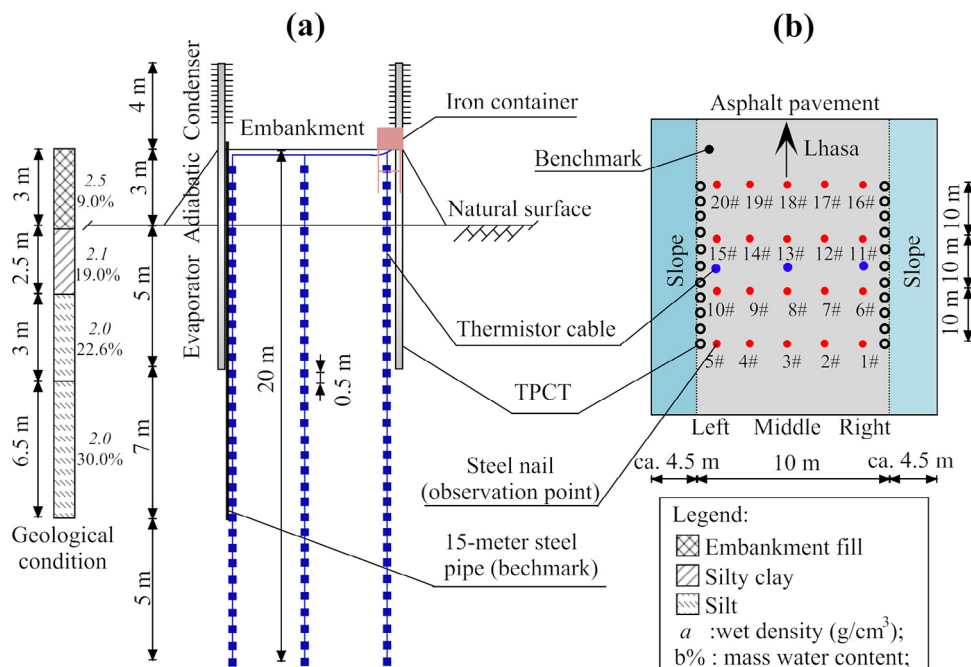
Schematic cross-section (a) and plan (b) of the instrumented road section installed with TPCTs.
